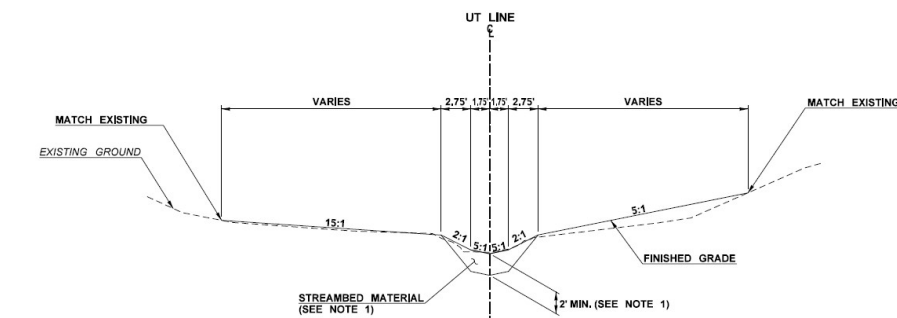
Reference channel-based design cross section for outside the culvert footprint.
